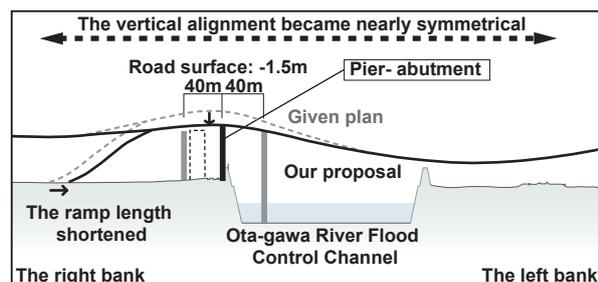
Reconfiguration of vertical alignment by installing pier-abutments
